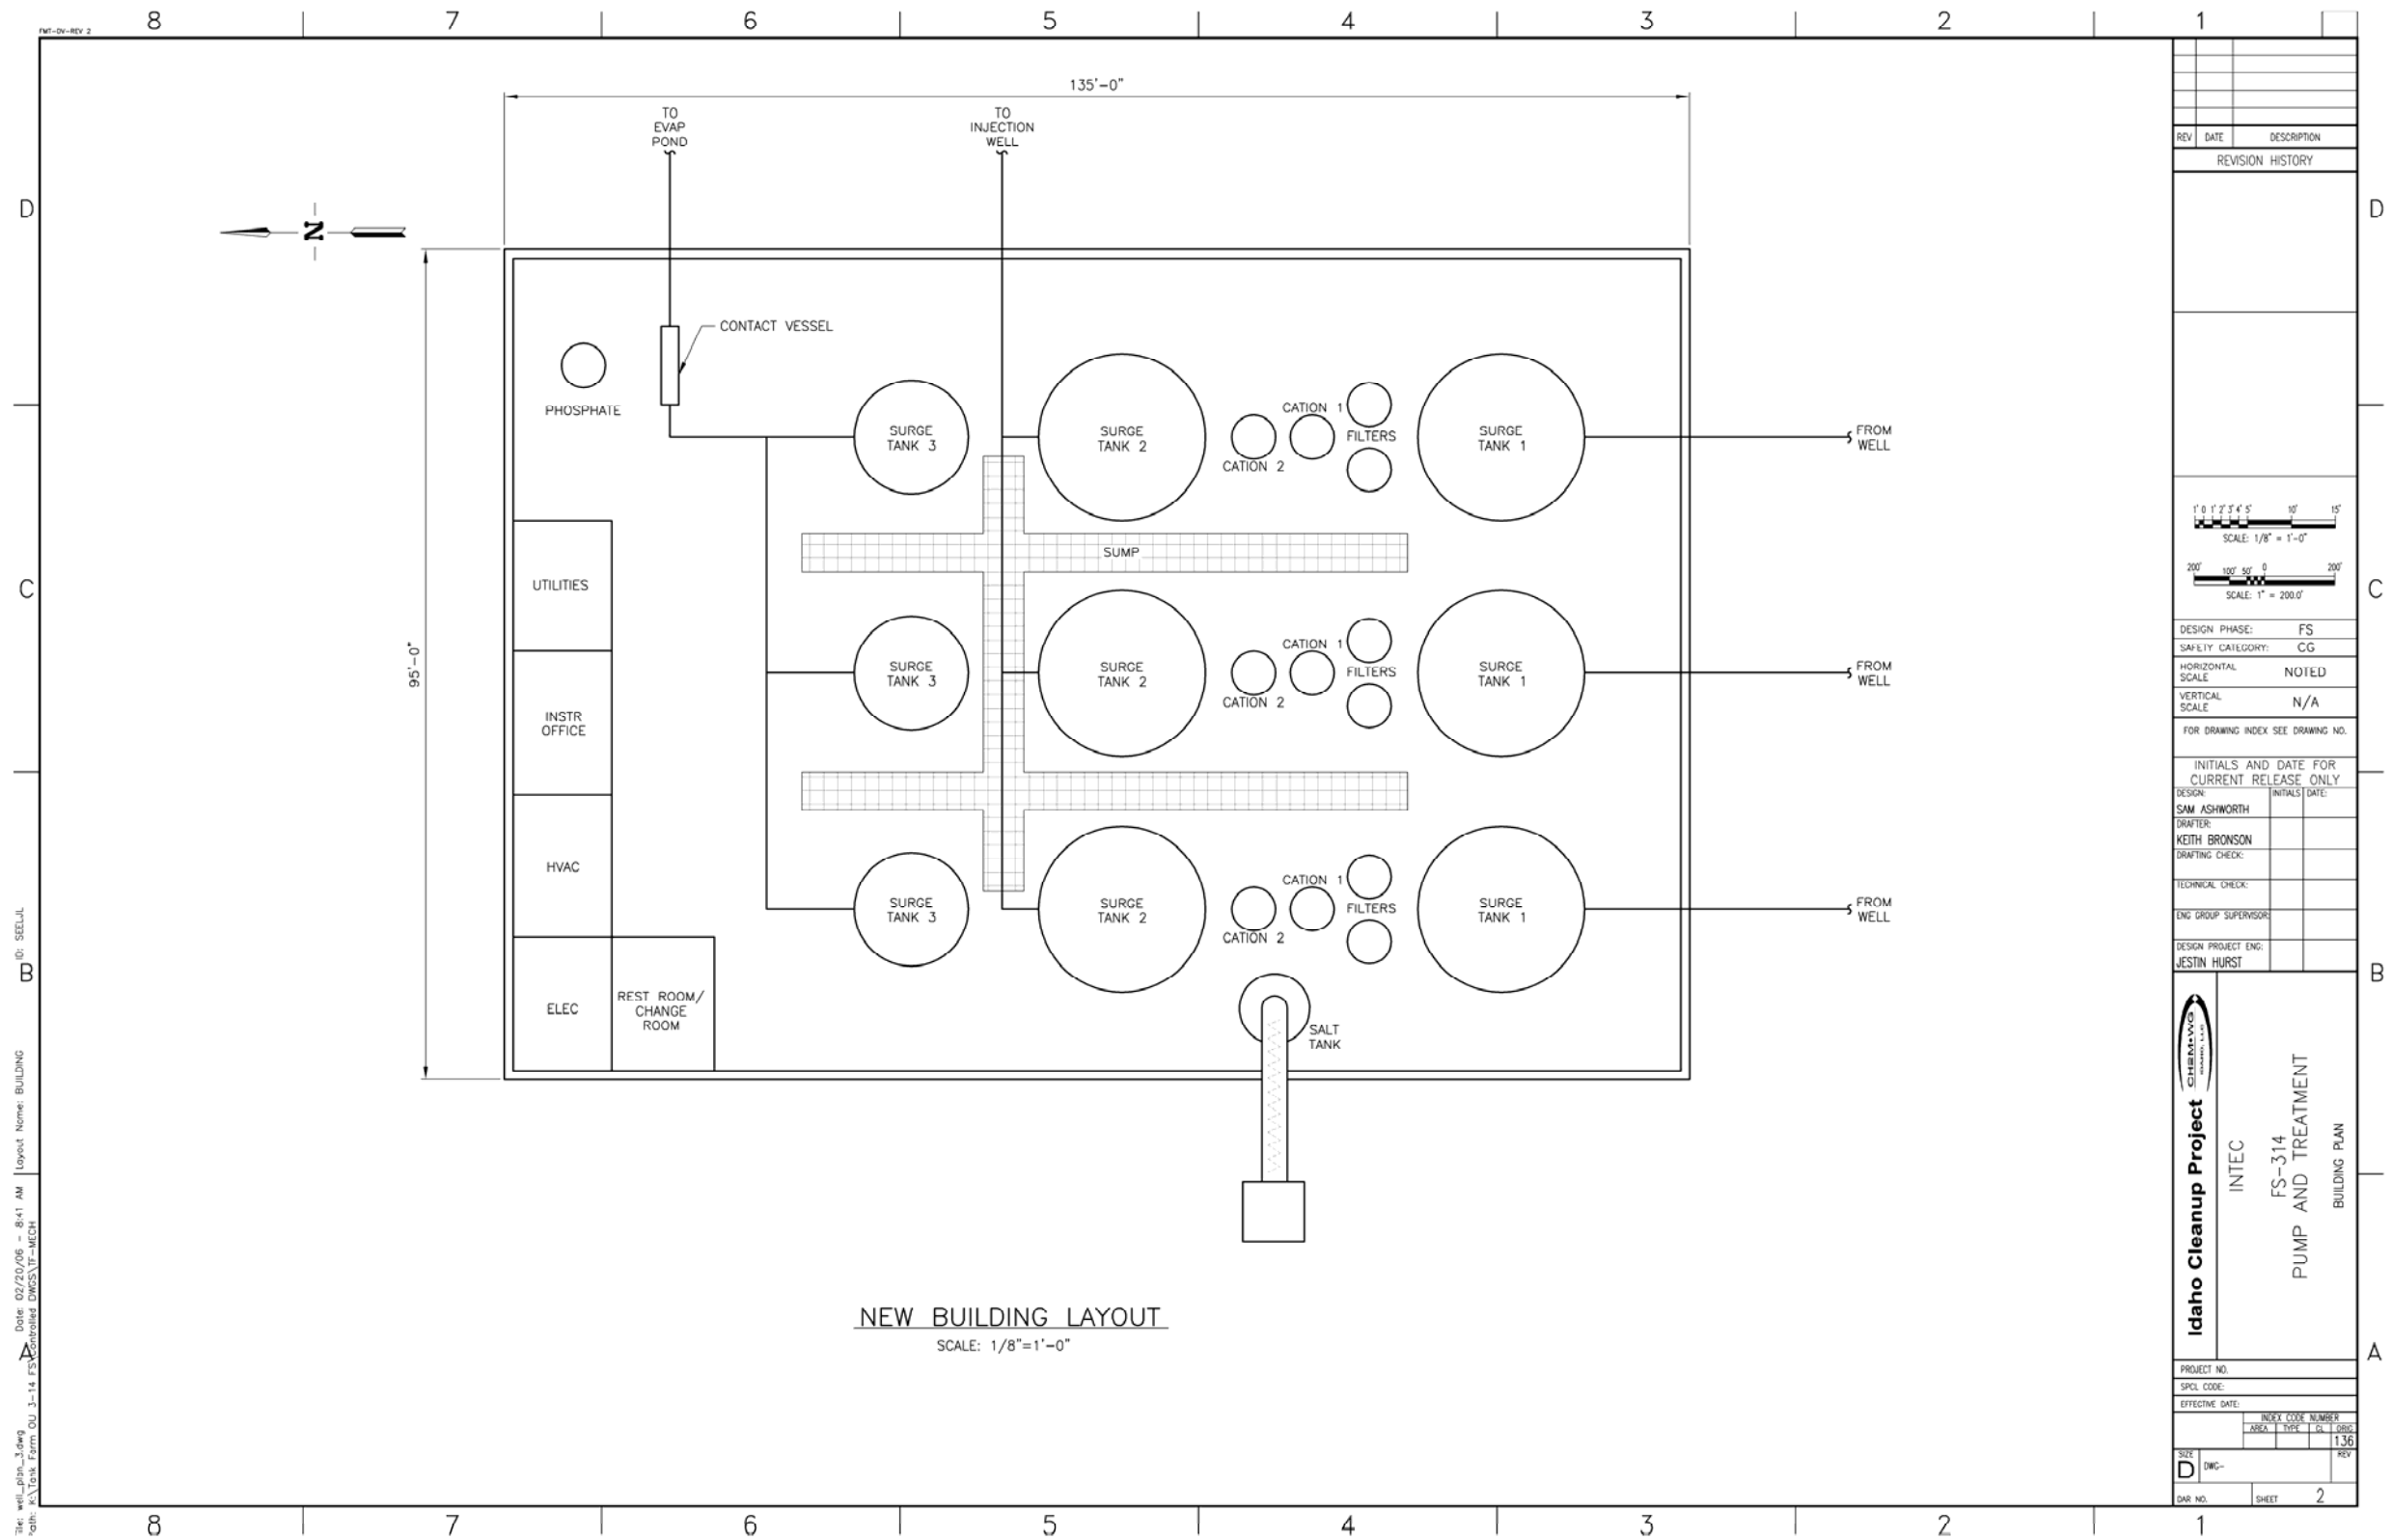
Layout for SRPA cleanup pumping and treatment.
